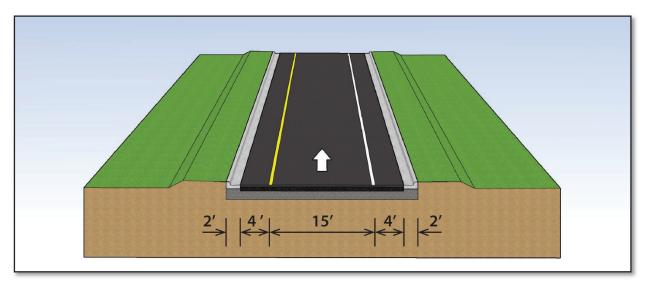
Existing Typical Section – Exit Ramp 6B
